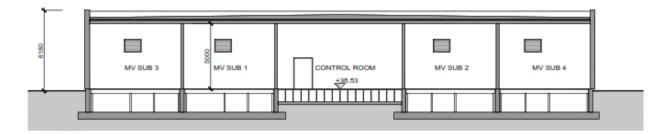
Extract from Reddy Architecture + Urbanism Section Drawing for the Client Control Building
